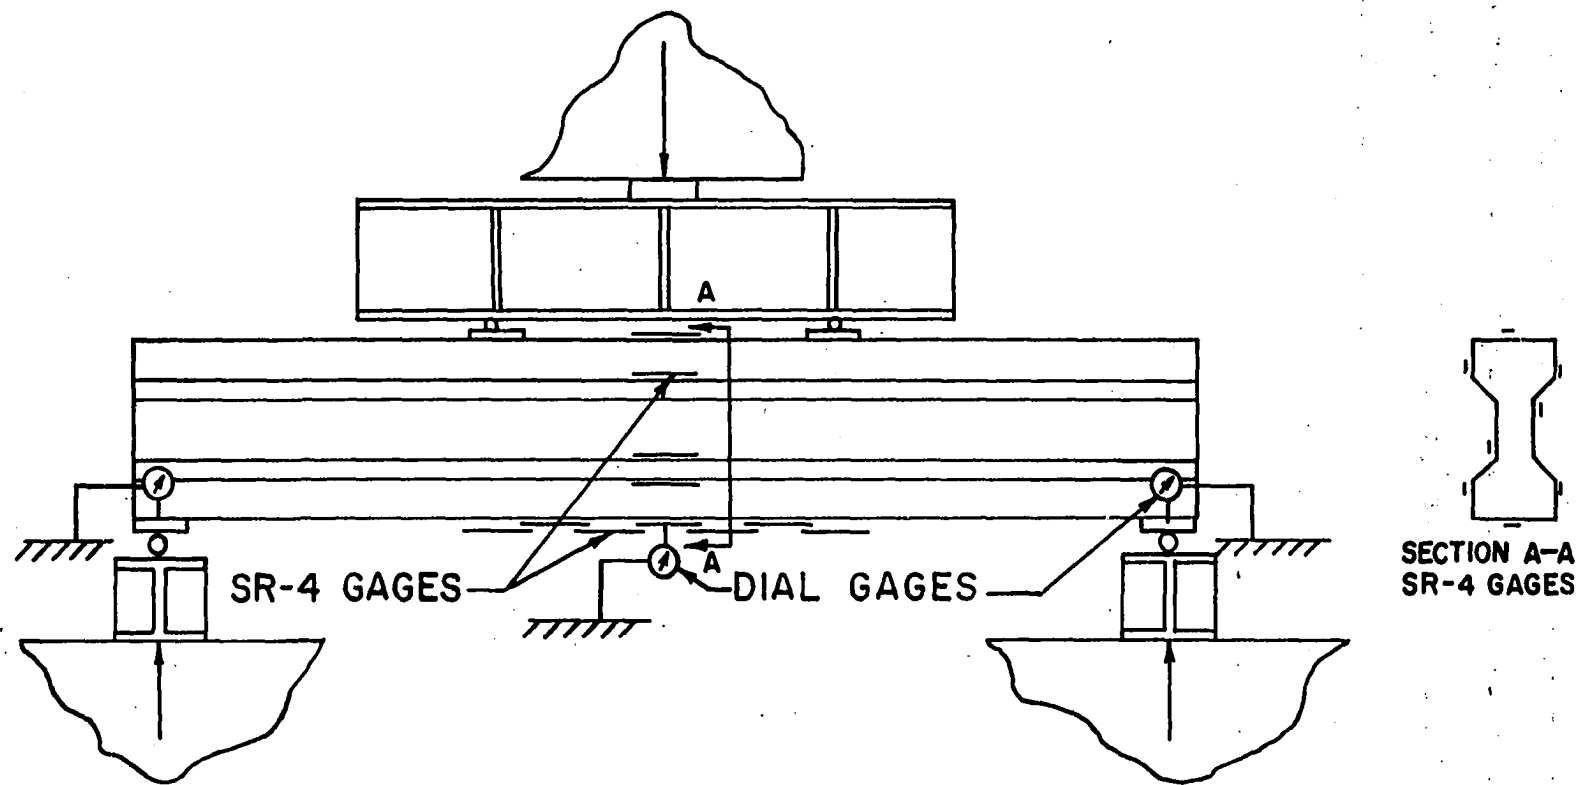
LOADING ARRANGEMENT FOR TEST BEAMS
